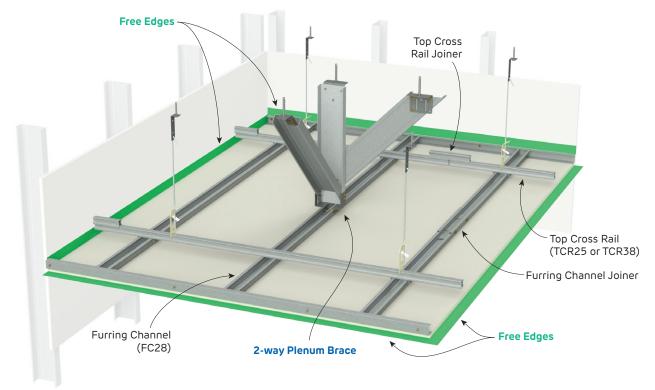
Suspended Ceiling - Type C, 2-way Plenum Braced 2-way Plenum Brace with four sides Free Perspective
